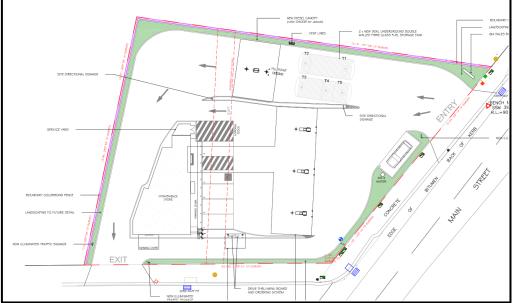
Extract of proposed site plan (Source: DA001, dated 24/6/24)
